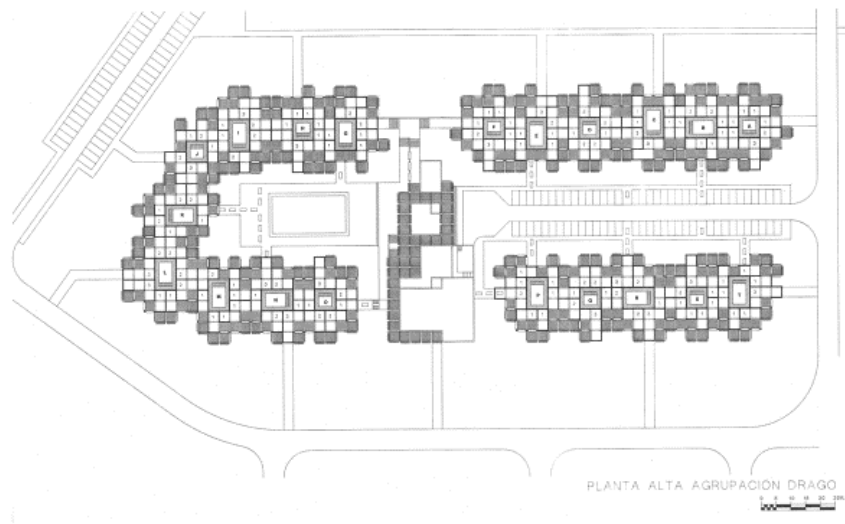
The *Drago* apartment ensemble_General layout. Top floor
